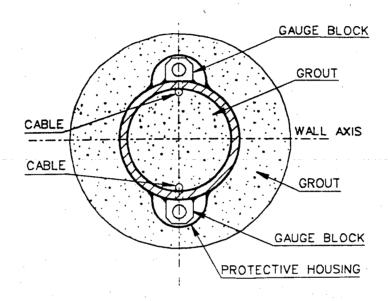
Cross-section of Instrumented Pile. (Wolosick, 1994)
